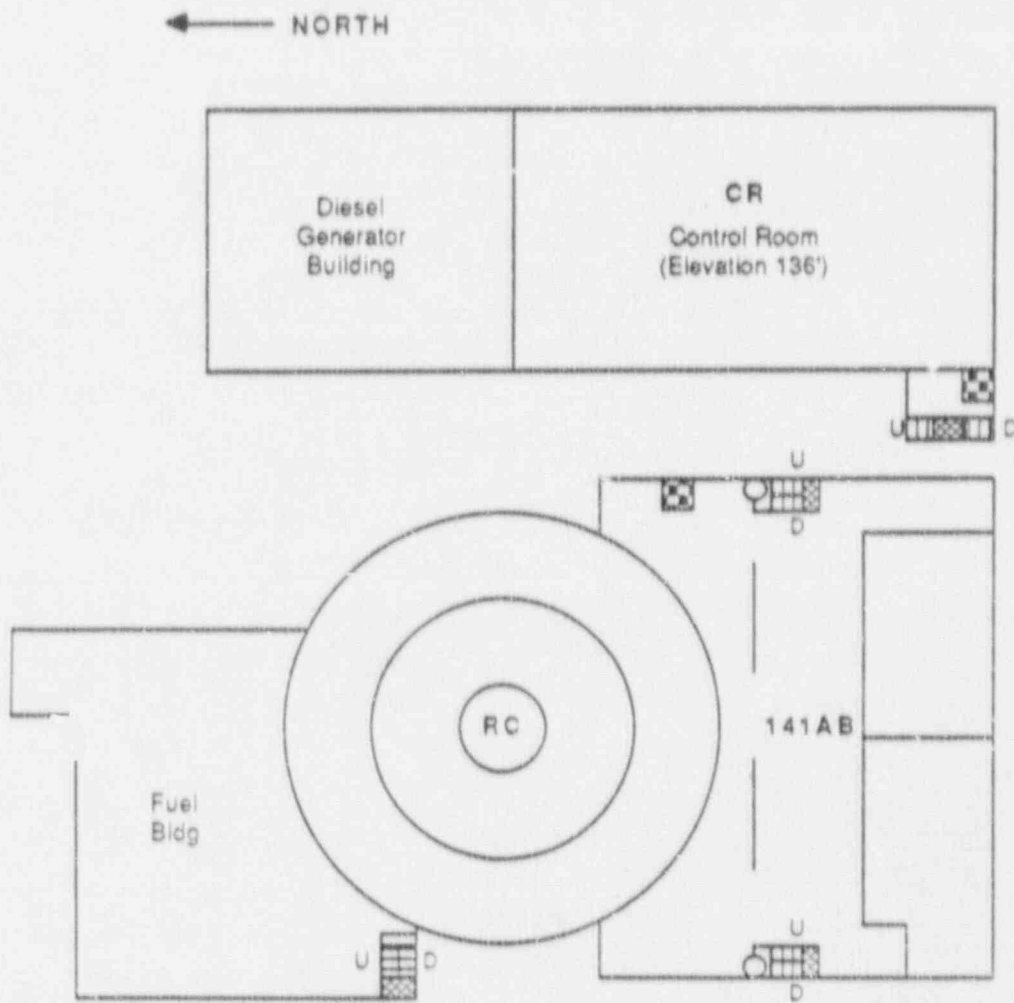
River Bend 1 Station Arrangement, Elevation 141'
